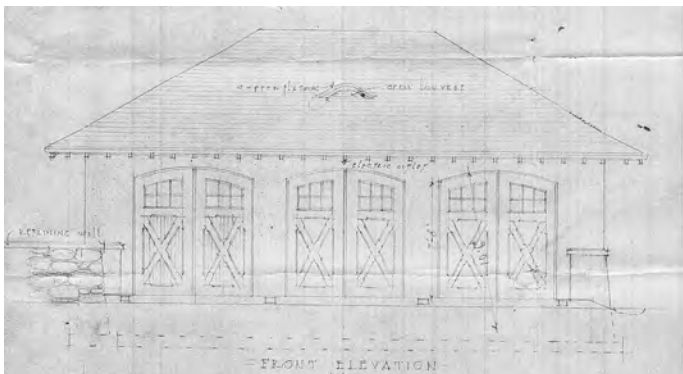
Original elevation drawing of garage. (Merestead Archives)
